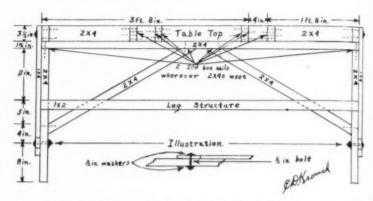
End view of standing 6x12-foot table showing three sets of rails, that carry 27 plant rooting flats, and one method of bracing the legs.
